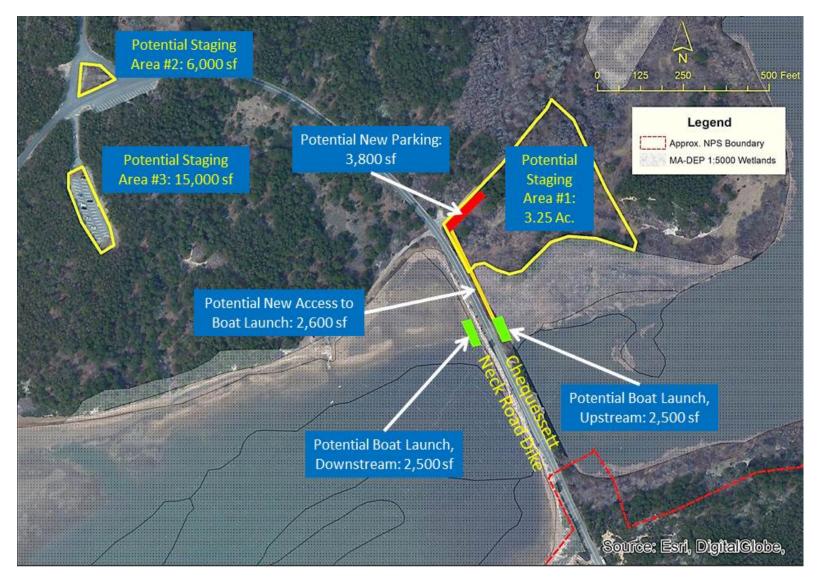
POTENTIAL CONSTRUCTION STAGING AND ACCESS POINTS FOR THE CHEQUESSETT NECK ROAD DIKE
